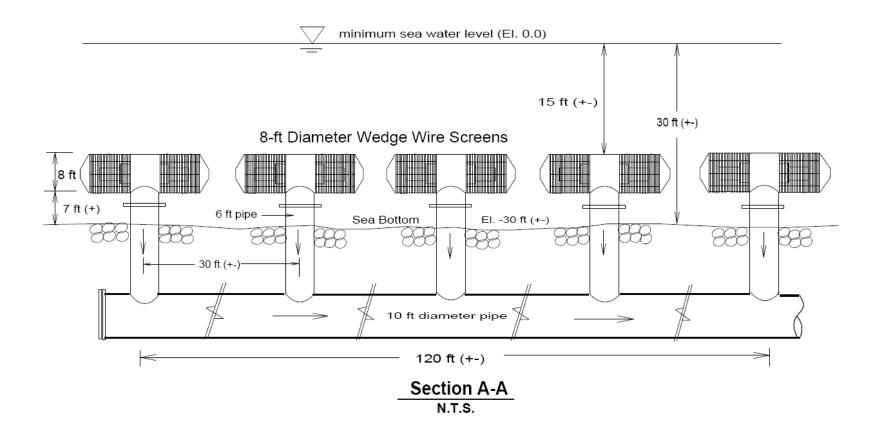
Sectional Viwe of Wedge Wire Screen Intake Modular Assembly
